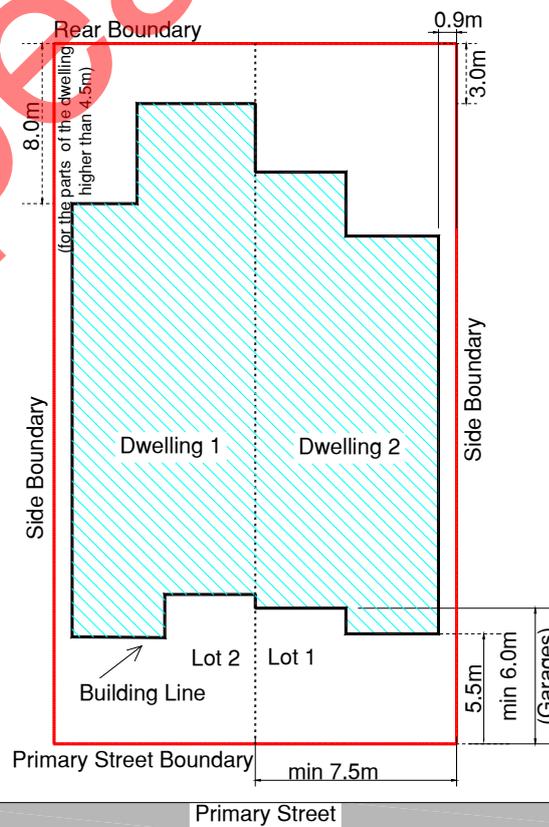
Illustration of the setbacks requirements for semi-detached dwellings.
